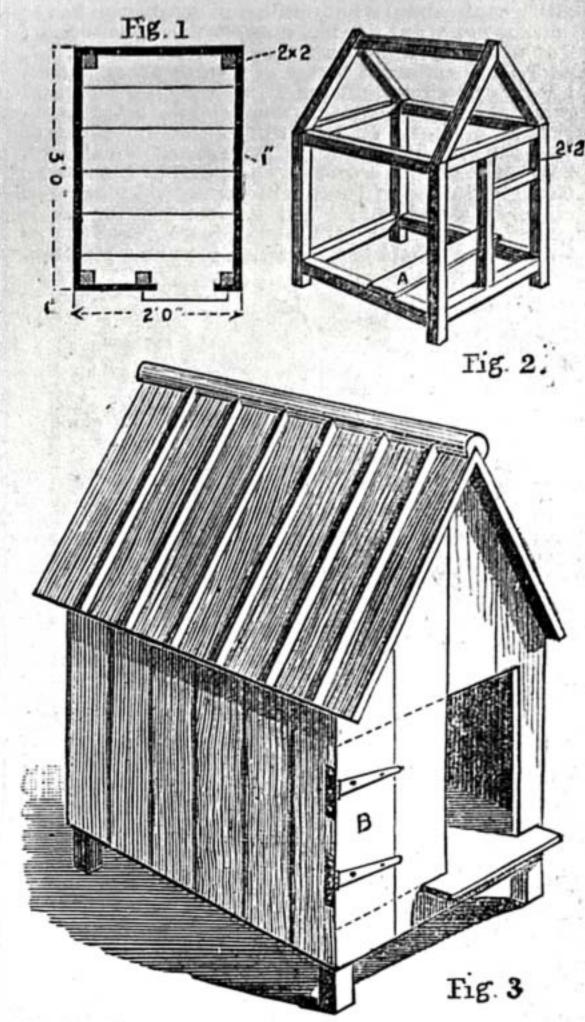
Plan. Fig. 2.—View, showing Method of constructing Framework—A, Floorboard in Position. Fig. 3.—Completed Kennel.
